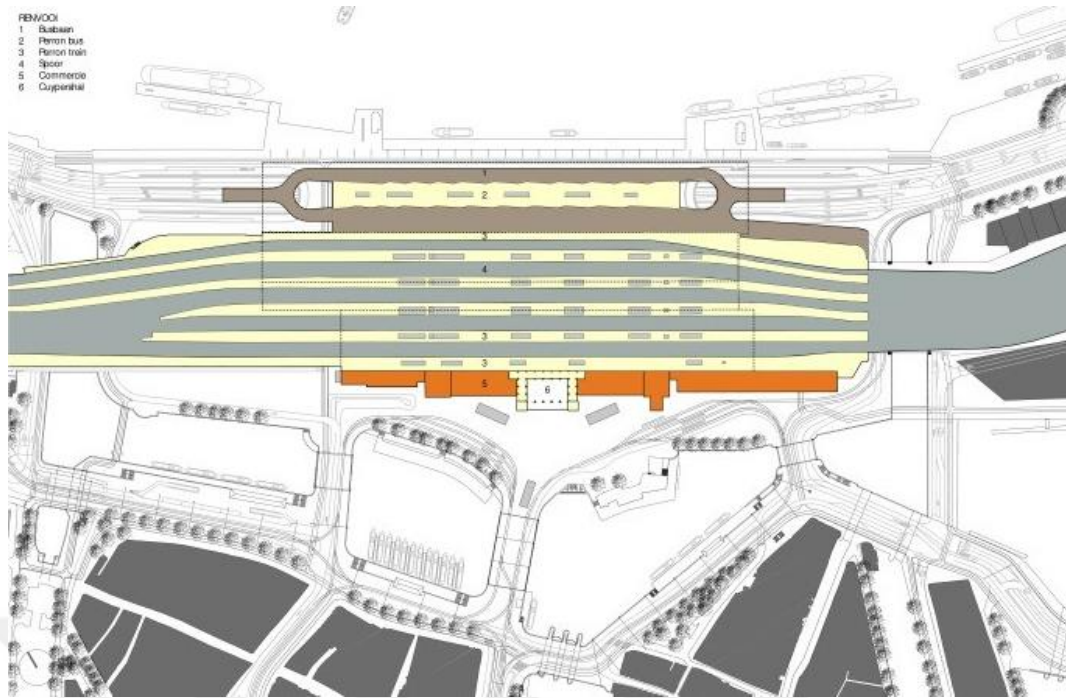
Layout plan of the station (Bentheim Crouwel Architects).
